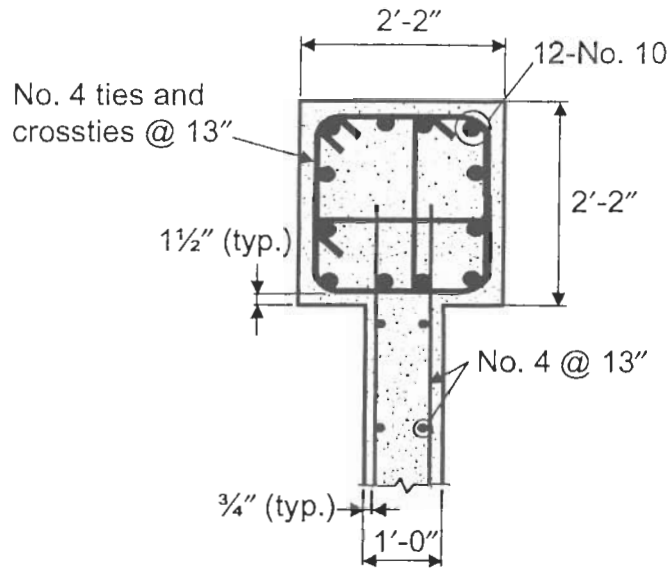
Reinforcement Details for Shear Wall Along Line 7 (SDC C)
